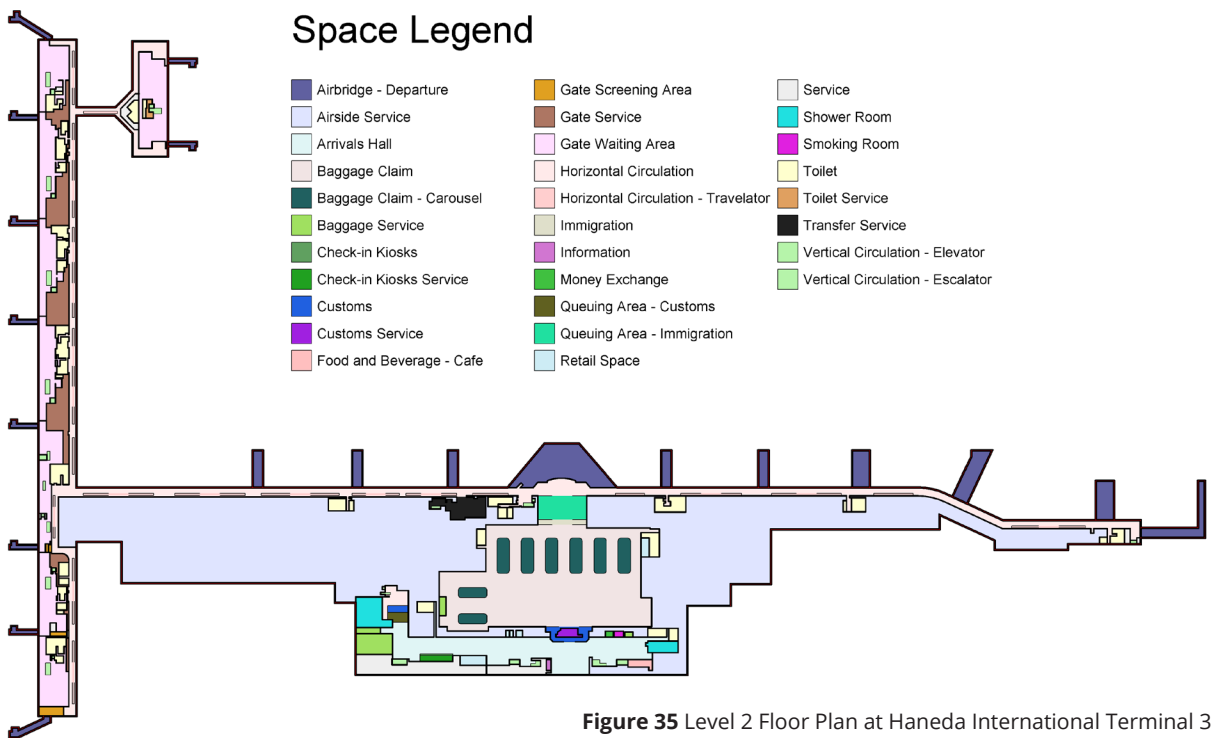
Level 2 Floor Plan at Haneda International Terminal 3
